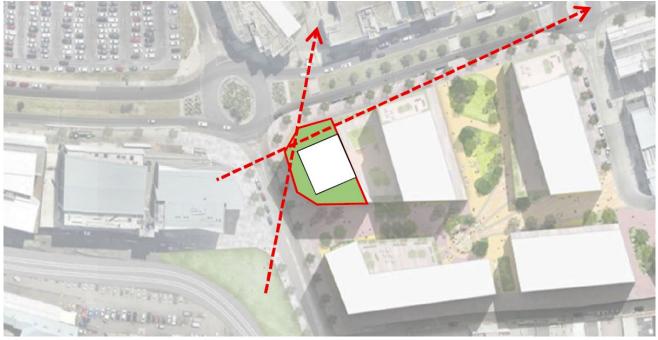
Proposed envelope of Building 1A, comparative to Building 1A envelope under Concept Plan Source: EJE Architecture
